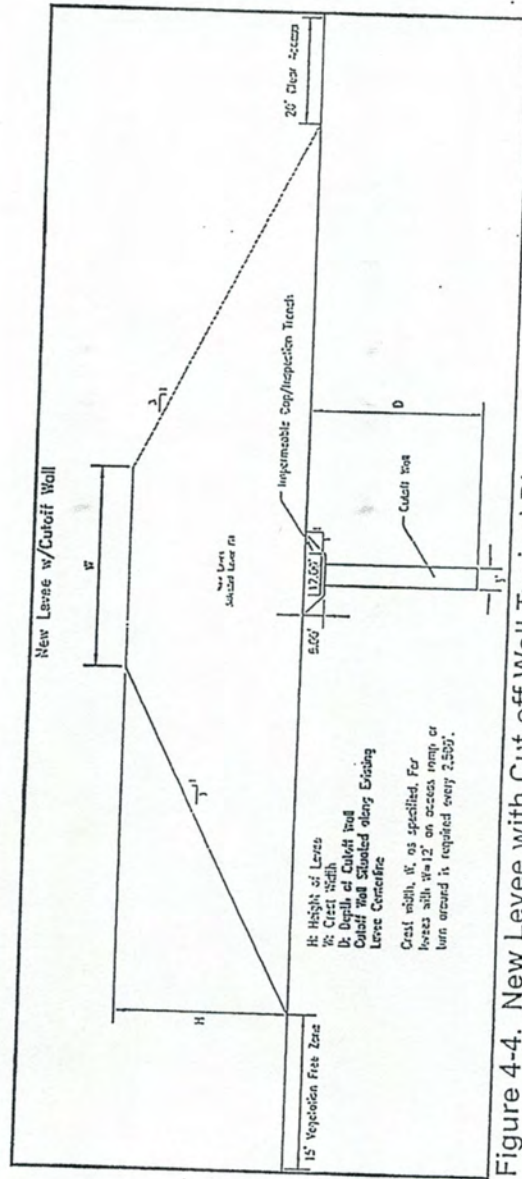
New Levee with Cut-off Wall Typical Plan.
